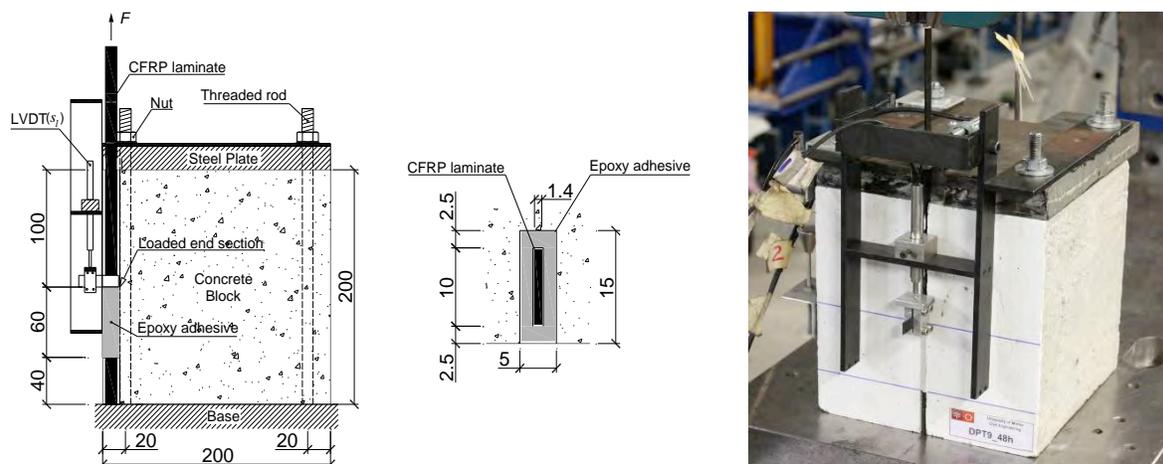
Direct pullout tests: specimen geometry and configuration [dimensions: mm].
